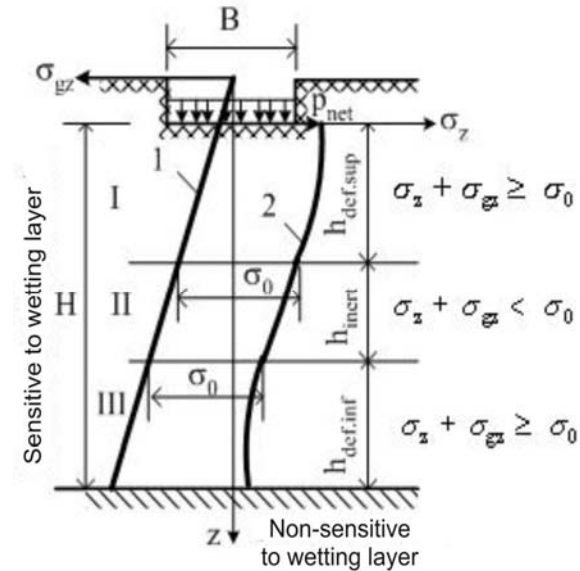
Characteristic zones in the foundation soil composed of collapsible soils
